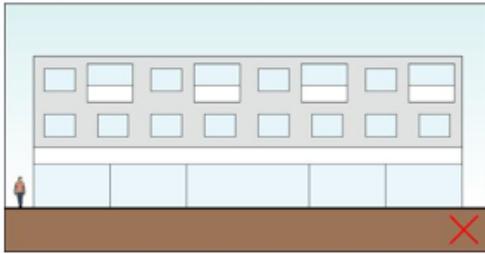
How not to do it: the ground floor and upper floors do not relate to one another architecturally
